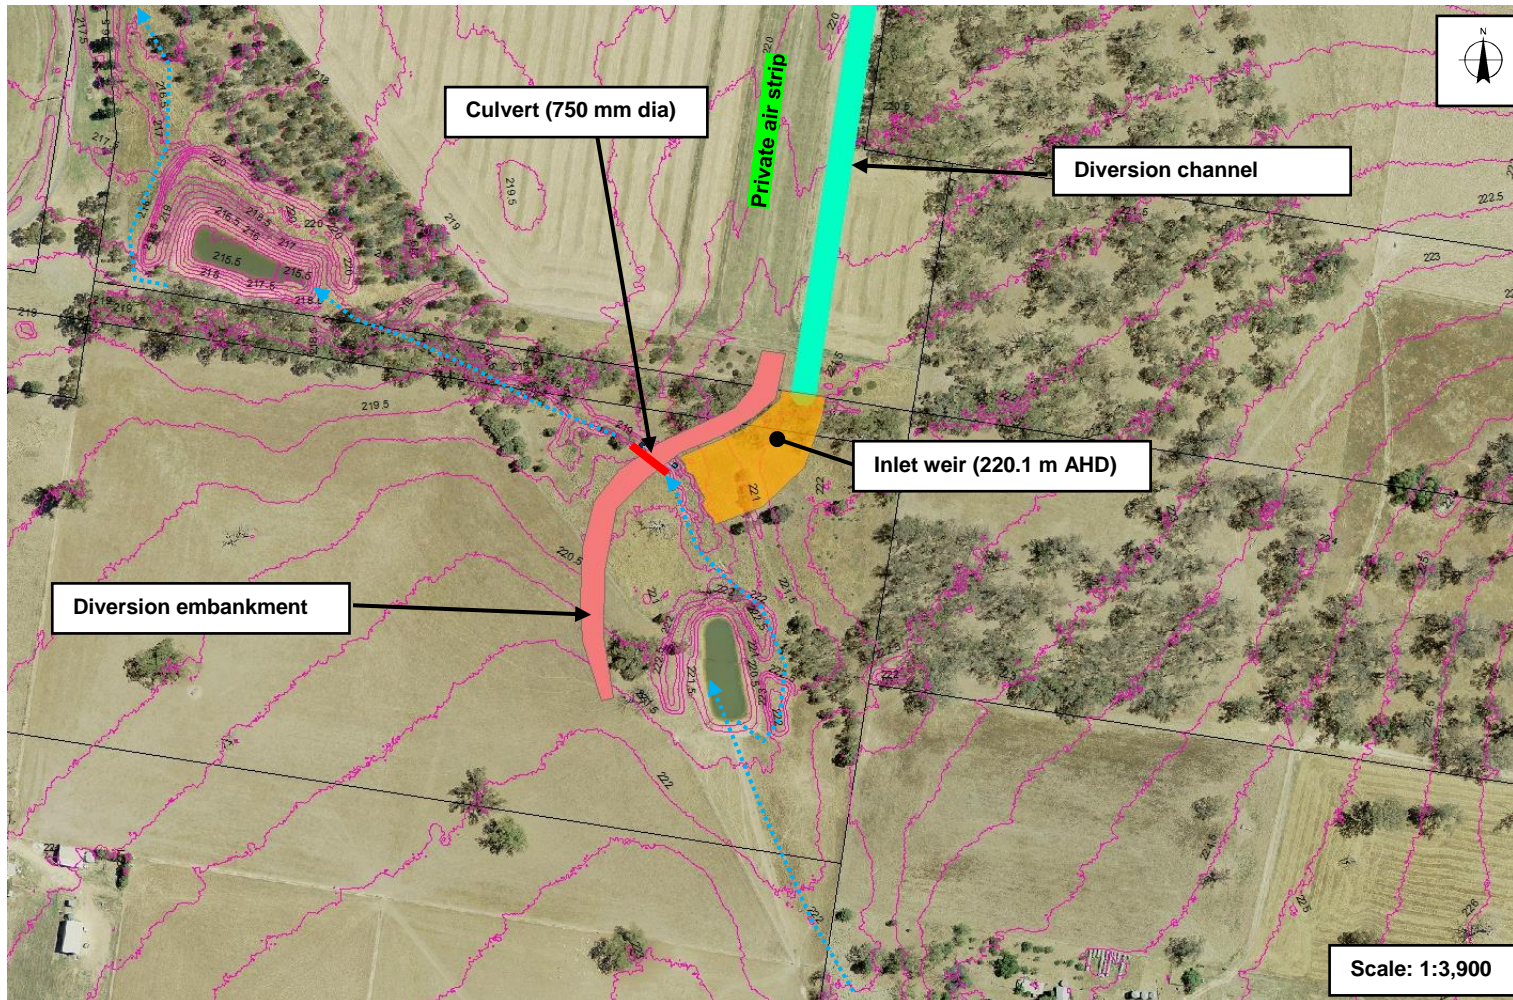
Queen Street Waterway Diversion Channel – Inlet Area
